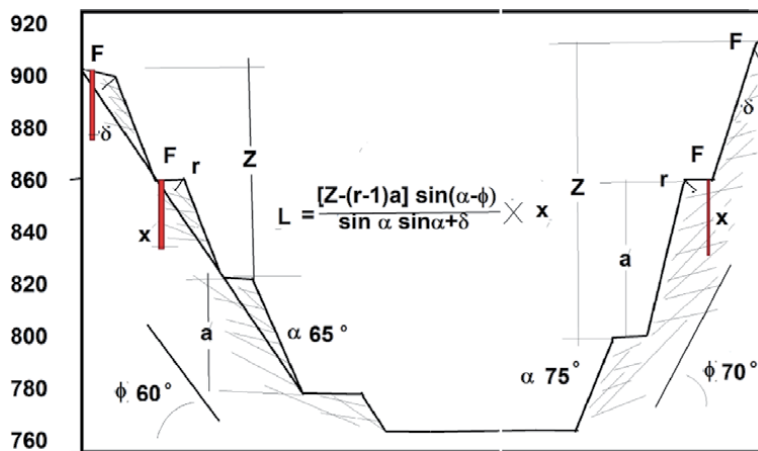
North and south steep slope faces of Avgamasya No. 1 pit of Şırnak asphaltite coal mine site and survey area with anchorage pile pattern.
